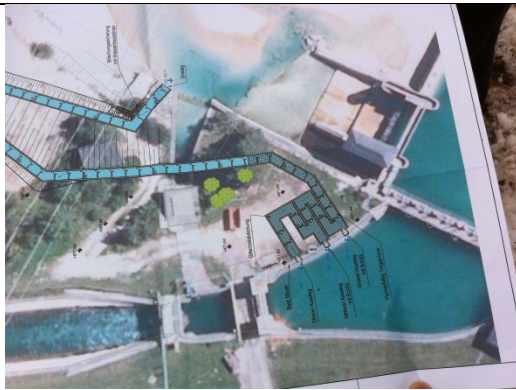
Plan of fish ladder to be constructed at Krün, 29.02.2012
